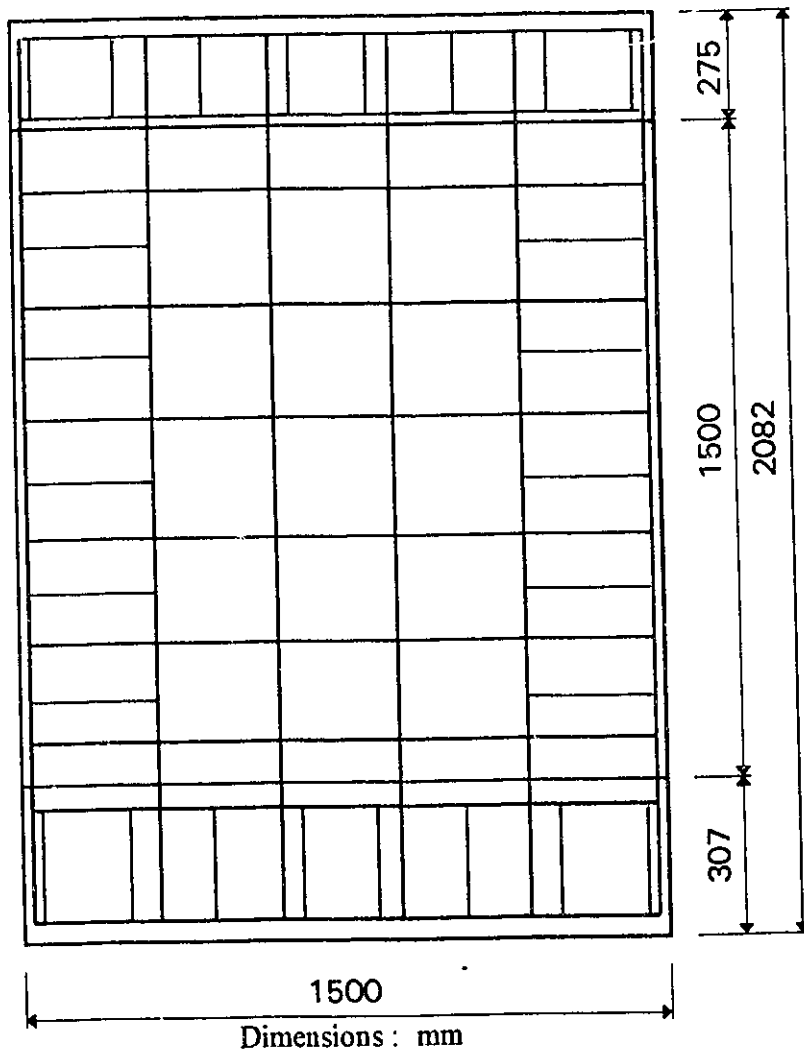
Geometry and Reinforcement Layout of Wall 8
